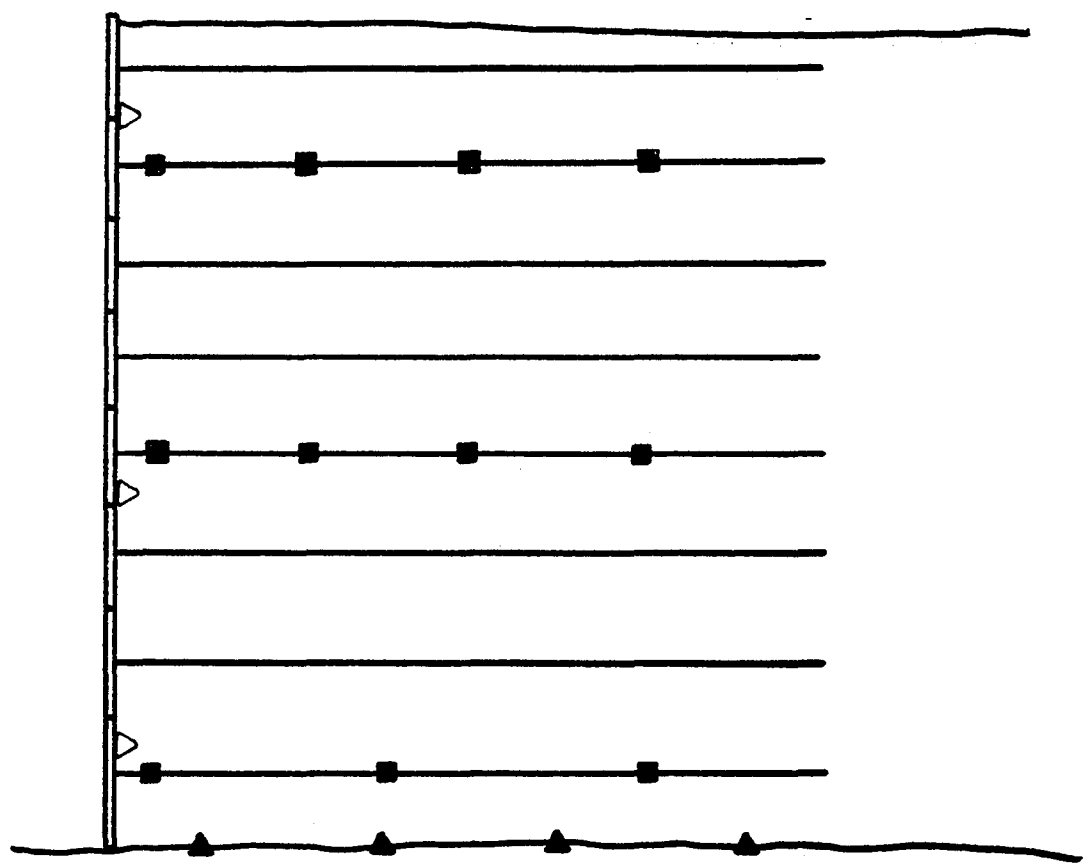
EXAMPLE: POSSIBLE INSTRUMENTATION FOR COMPREHENSIVE STABILITY MONITORING OF MECHANICALLY STABILIZED EARTH WALL
